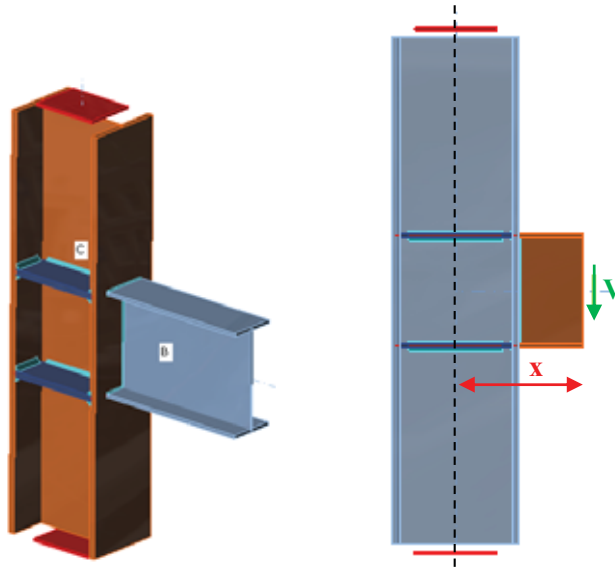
Benchmark example of the welded beam to column joint with force eccentricity
